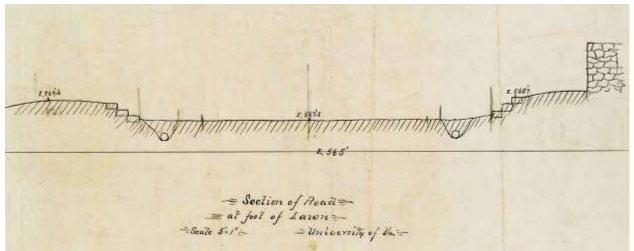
A "Section of the Road at the foot of Lawn" records the sunken surface of the road, drainage, steps, and stone wall prior to construction on the South Slopes in 1896. The recessed road reduced the visual clutter of traffic from the vista at the end of the Lawn. Courtesy, The New-York Historical Society. (R-JAV-NYHS-MMW-c1896-87780d_UVARdSection_MMW-M-5-road section foot of lawn-crop.jpg)
